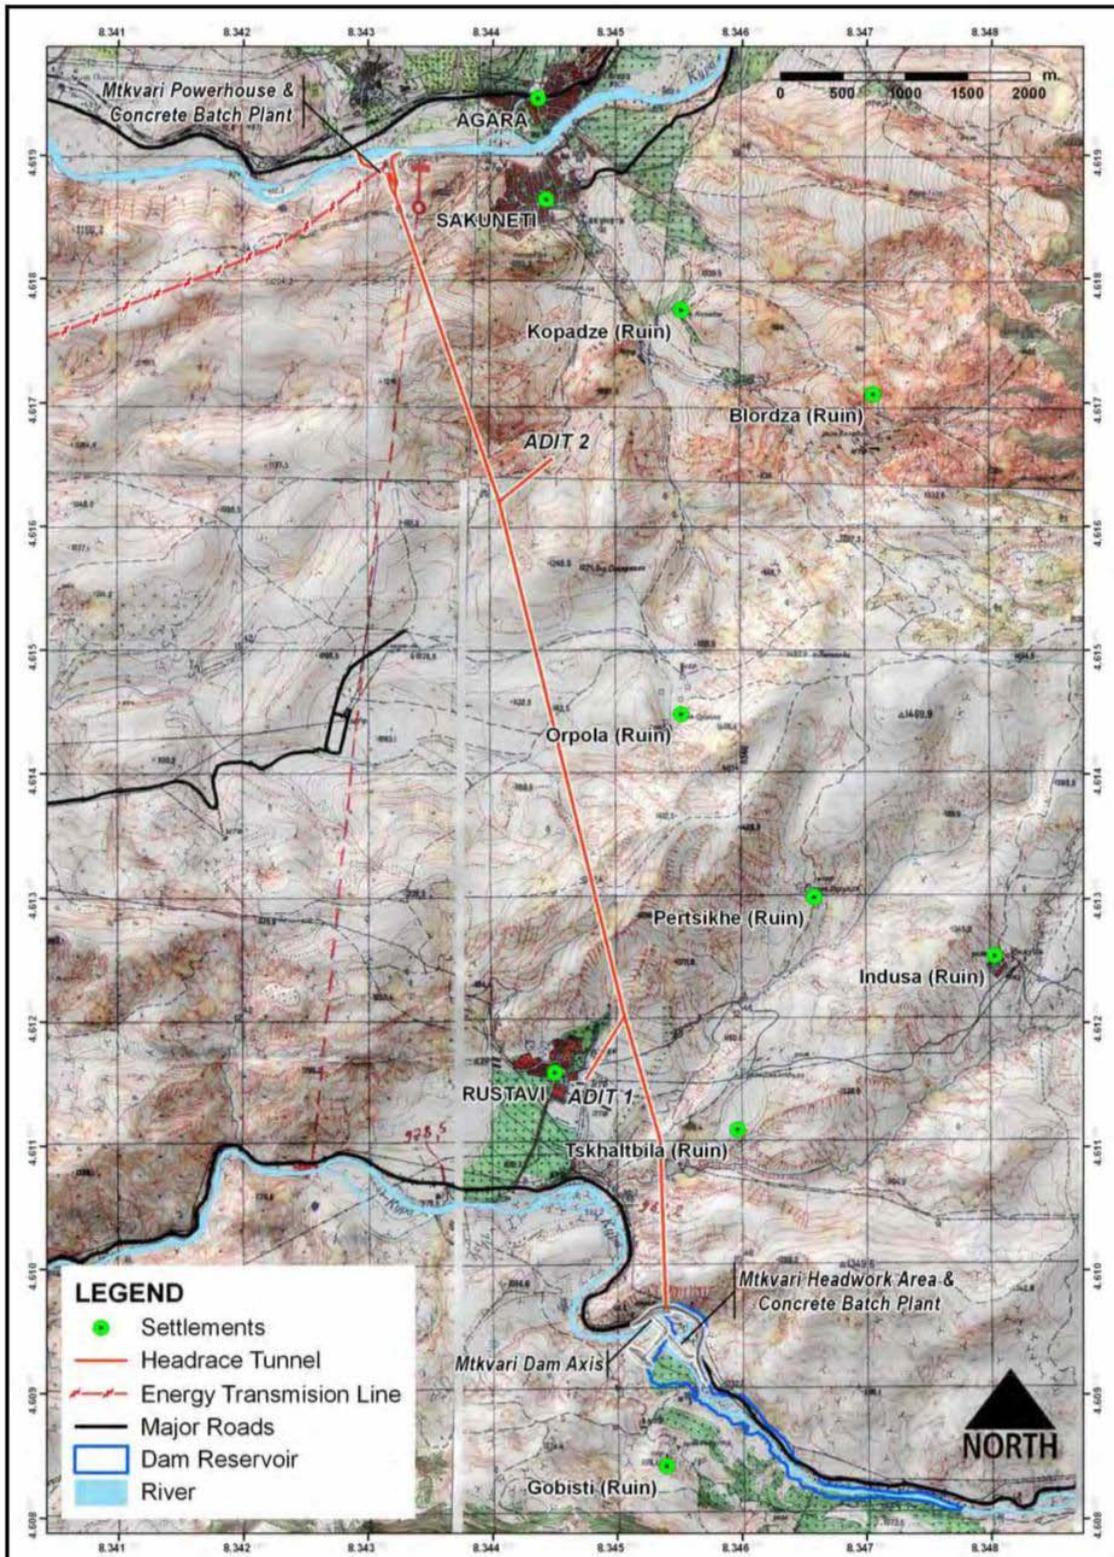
The layout of Mtkvari Hydropower plant
